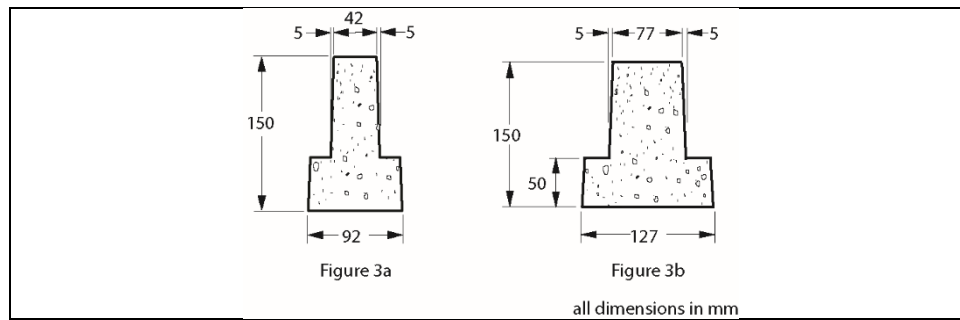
Precast concrete beams used for structural testing and thermal calculations
